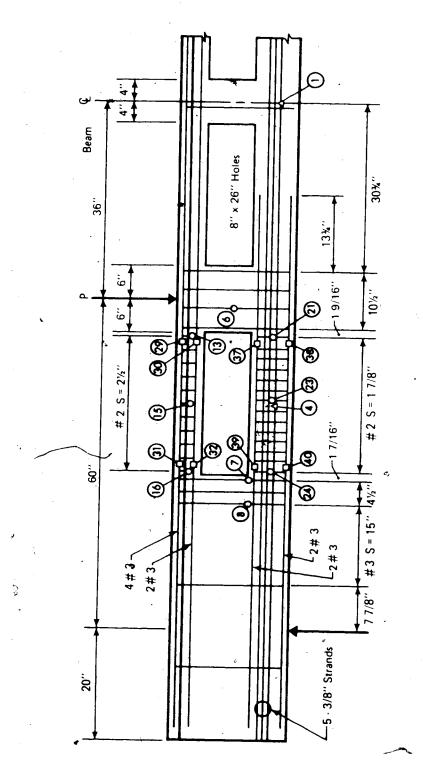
Reinforcement Details and Strain Gage Locations for Beam 20-26-5
